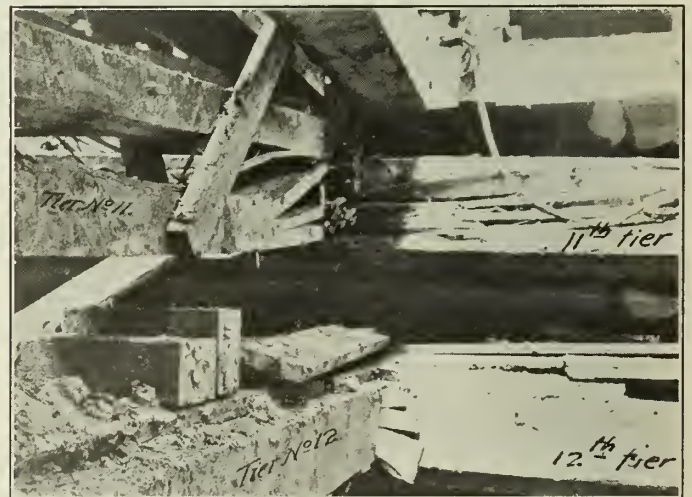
View showing Failure of Timbers in Pit H, August, 1927.
